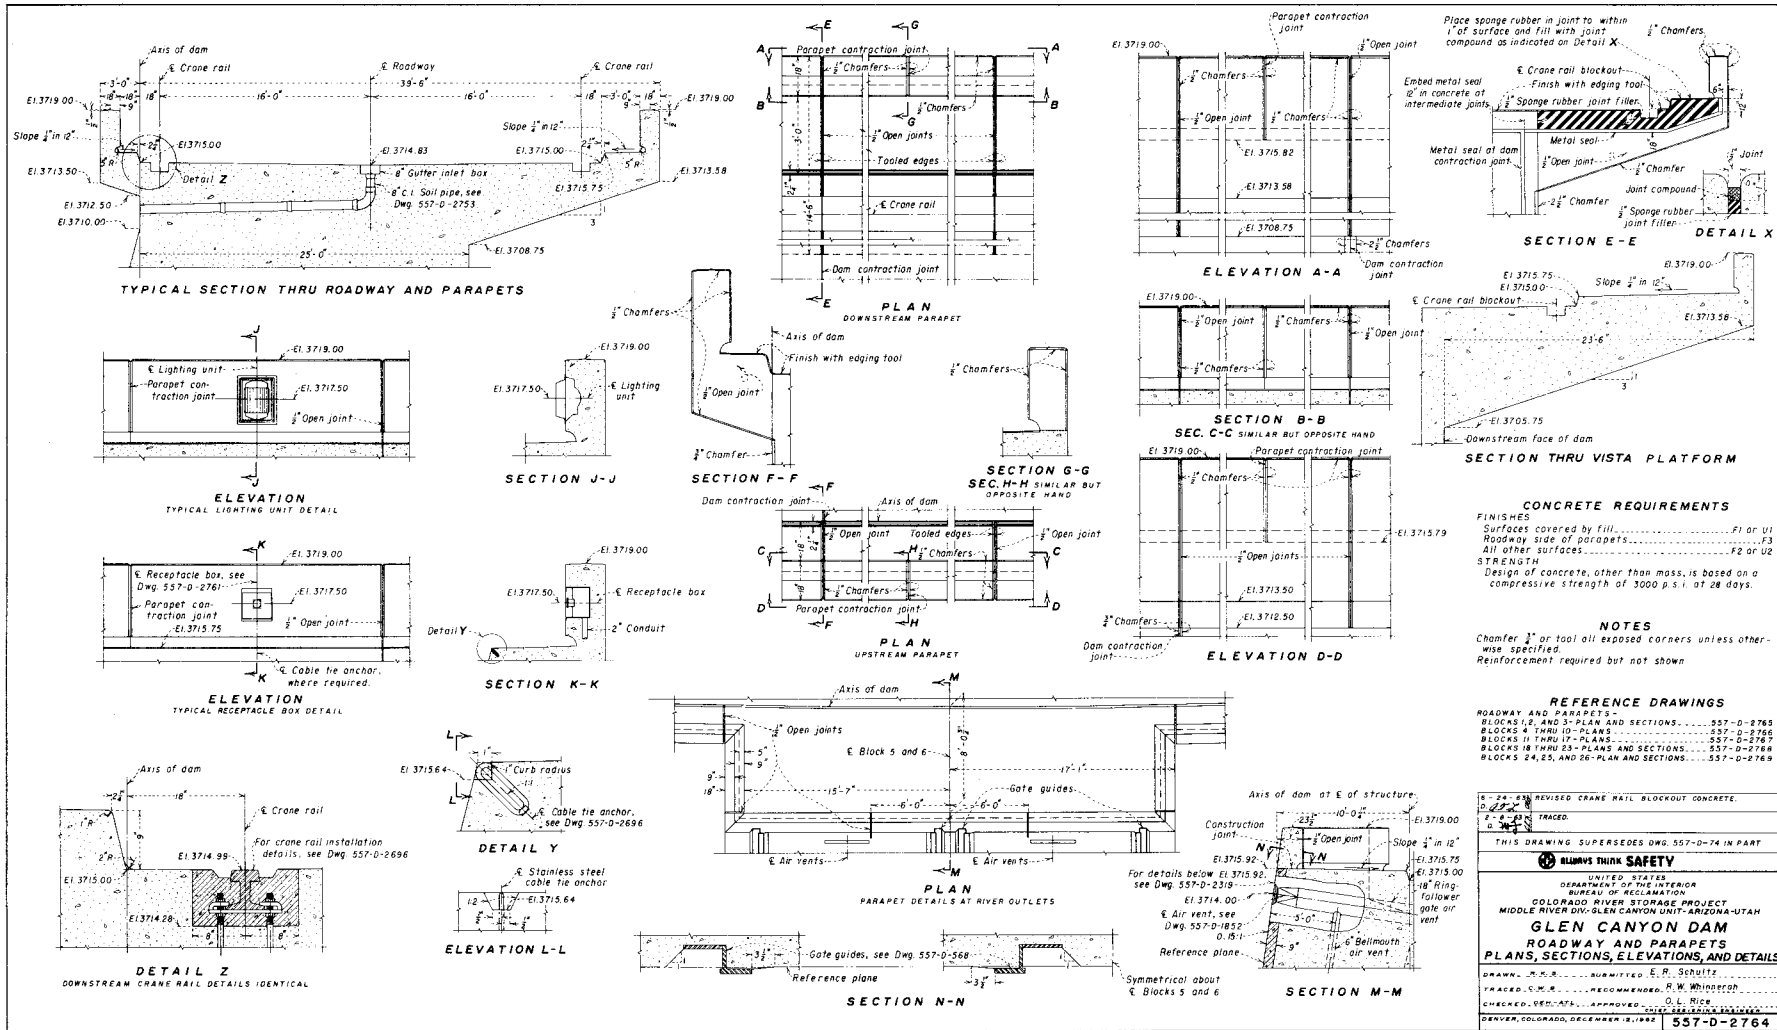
Dam roadway and parapets—Plans, sections, elevations, and details.
